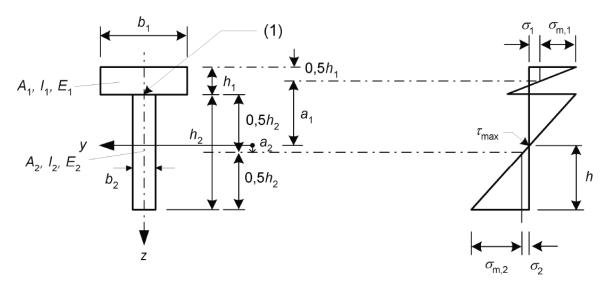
Cross-section and stress distribution built-up beam, gamma method [83]
